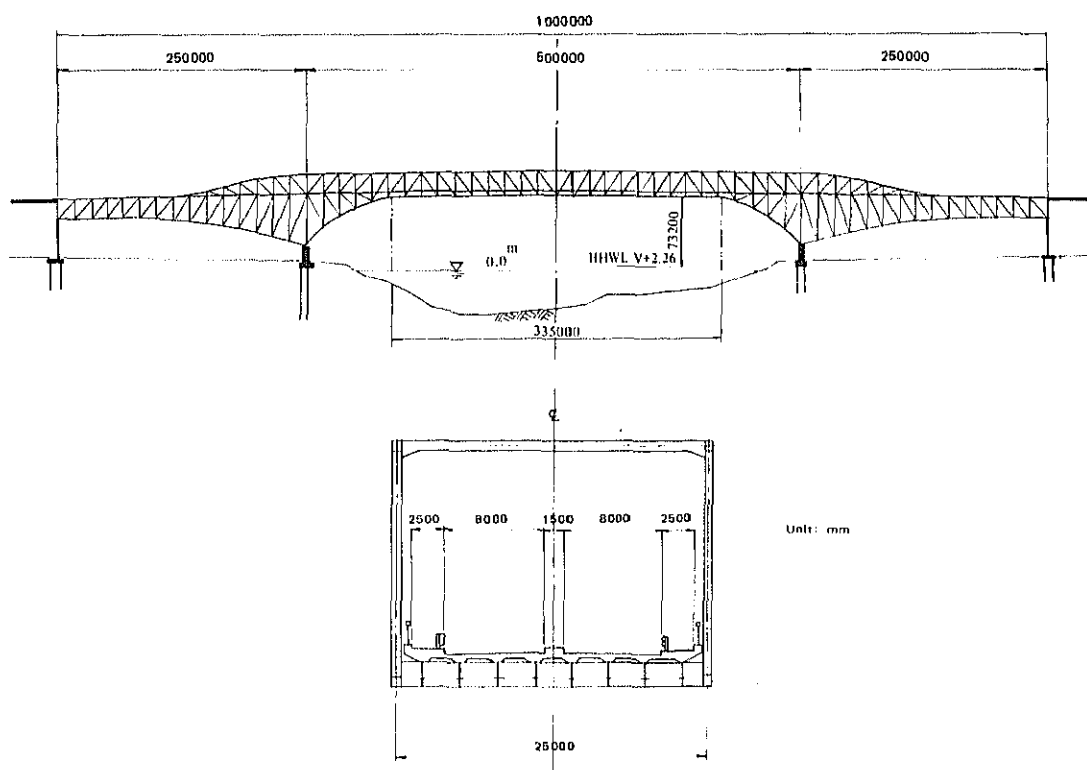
CANTILEVER TRUSS BRIDGE
